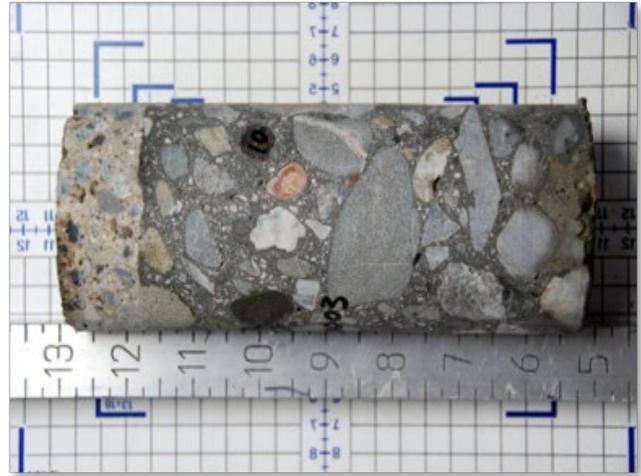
B: Core samples to evaluate concrete reinforcing steel
